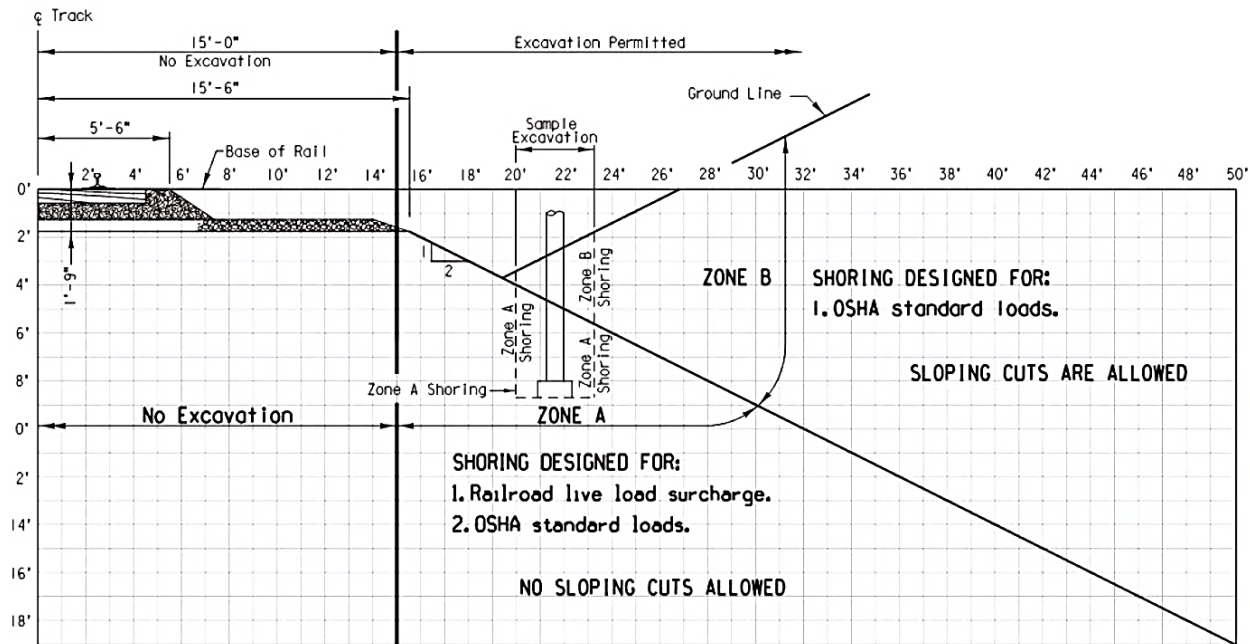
Shoring Zones from the GUIDELINES, Section 3, Figure 1
